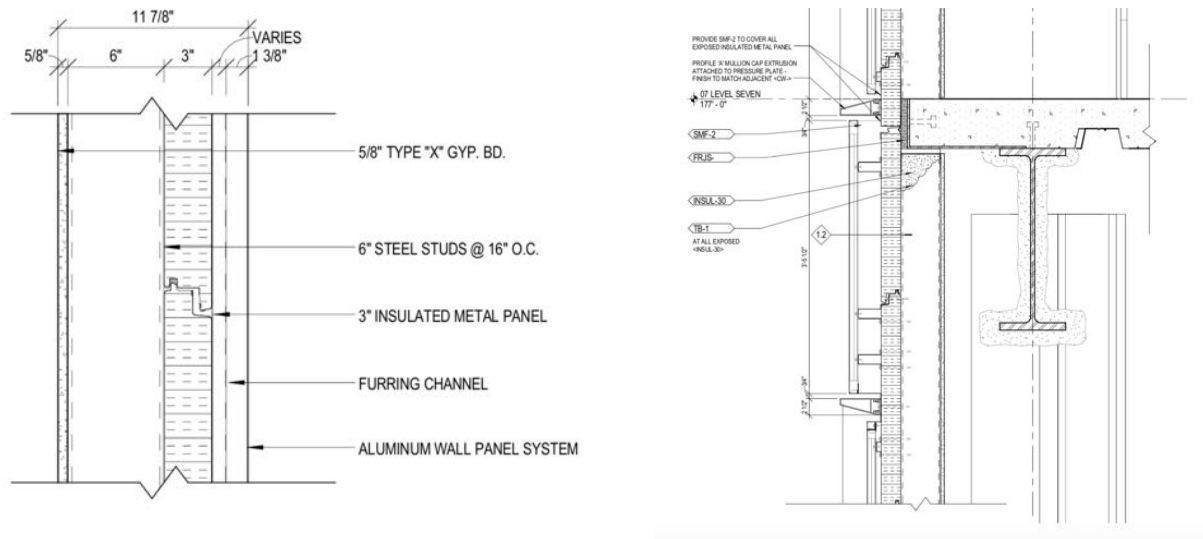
Exterior Metal Panel Wall Sections (provided by HGA)
